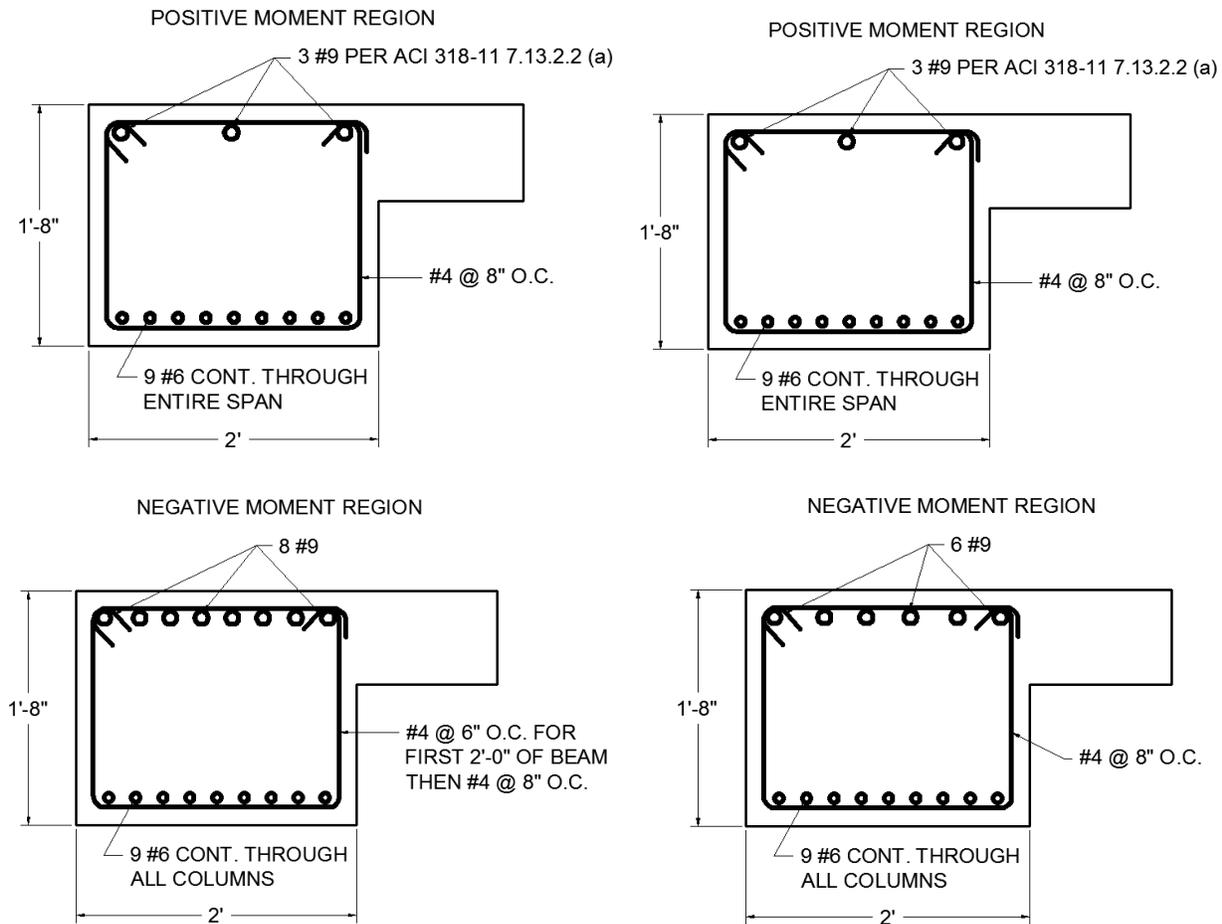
Beam Designs (N-S on Left) (E-W on Right)
